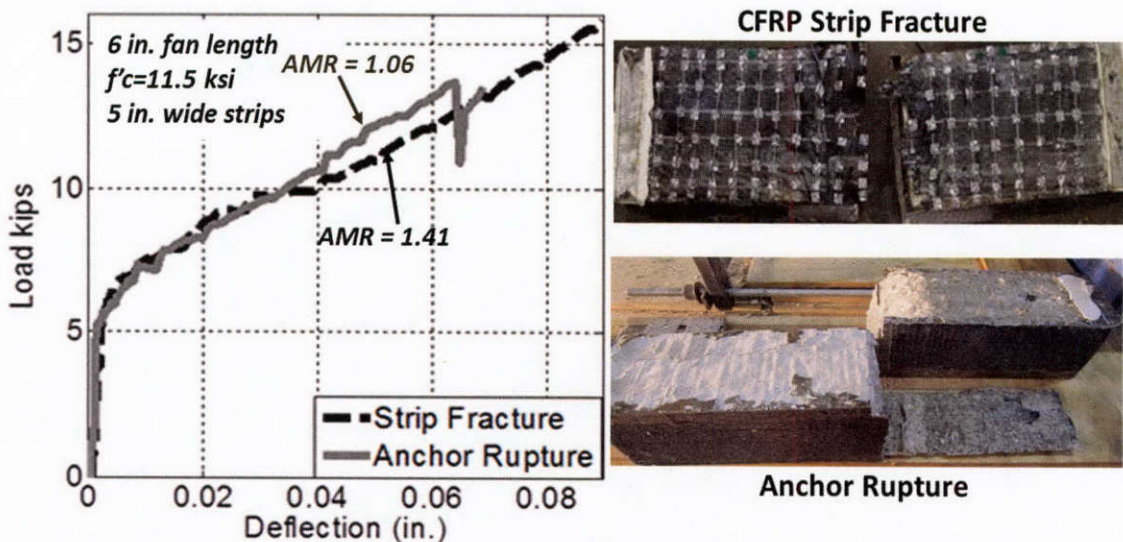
Typical load deflection plots for strip and anchor failure modes (Sun 2014)
